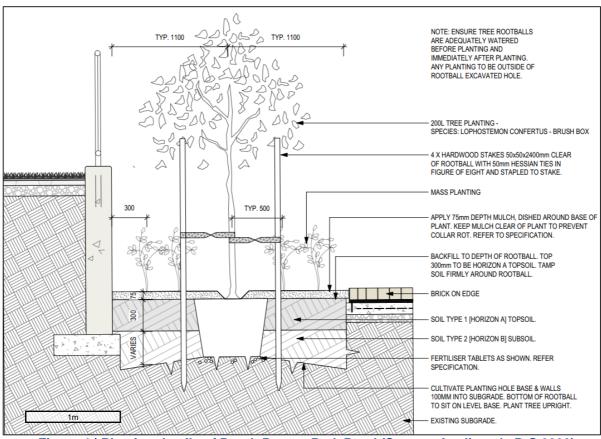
| Planting details of Brush Box on Park Road (Source: Applicant's RtS 2022)
